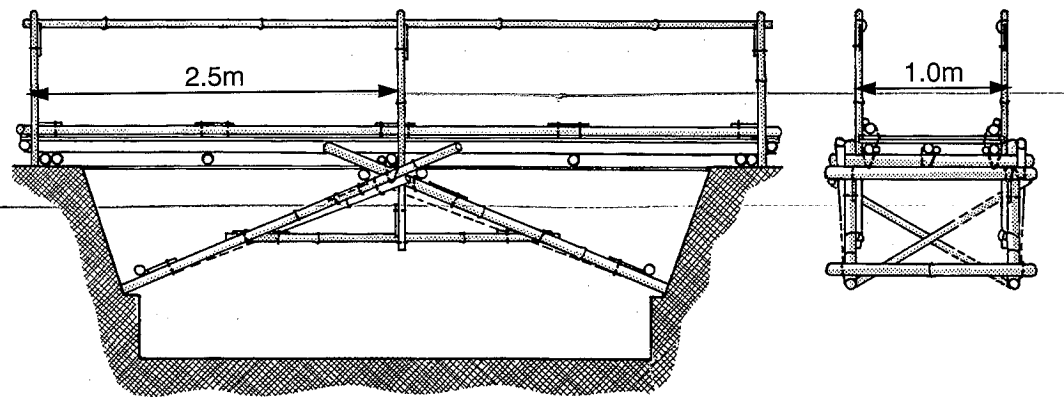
Simple truss (flying buttressed) bridge (after Janssen/Trojani, 1982)
